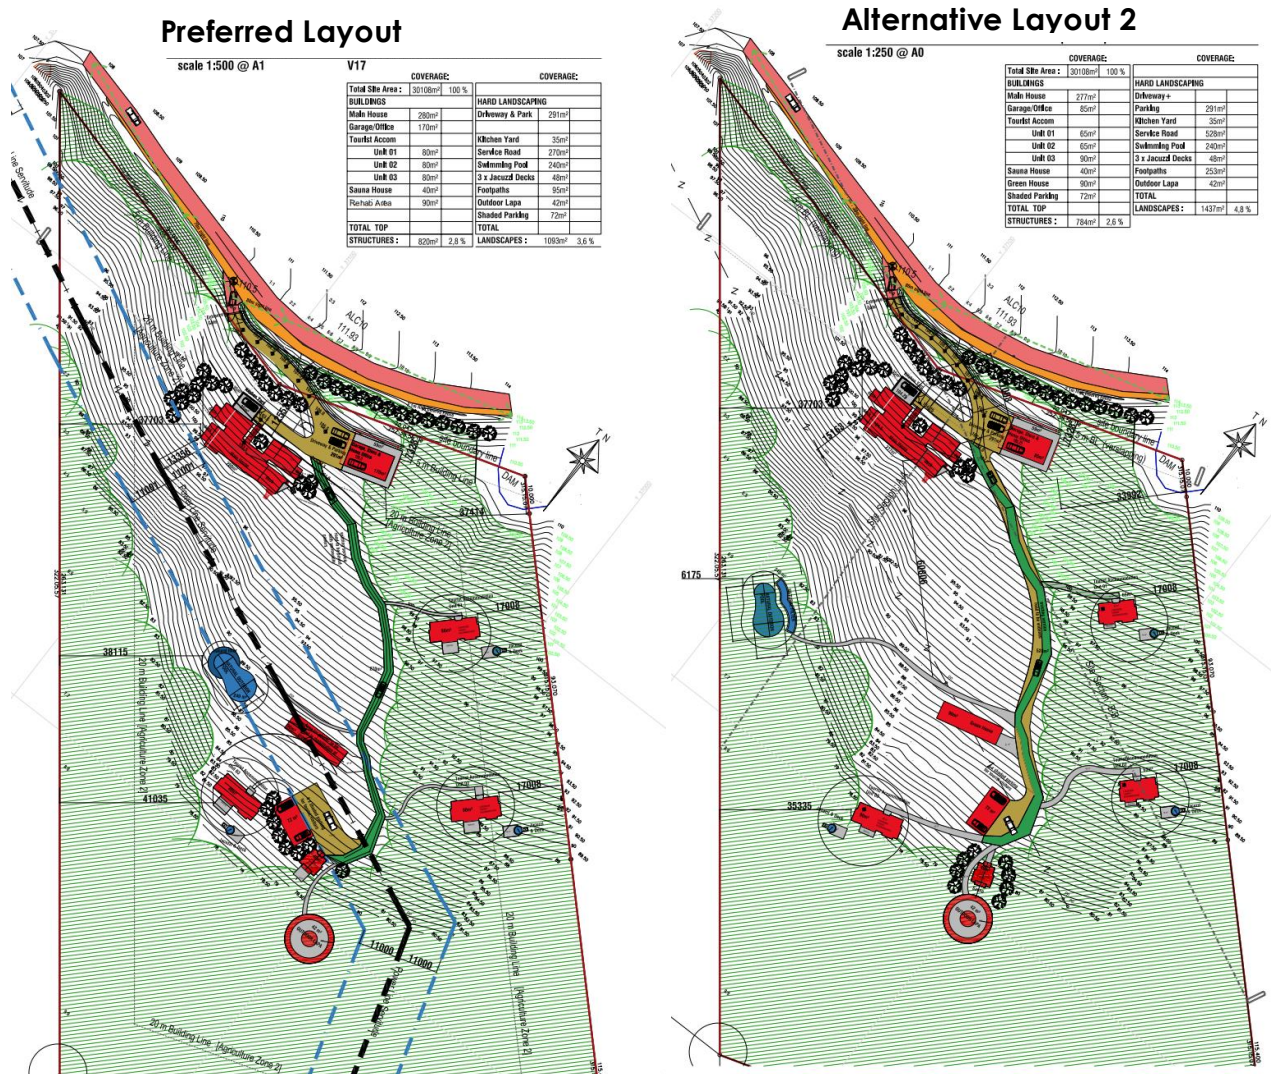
Alternative Layout 1 (Preferred Layout) and Alternative Layout 2.
